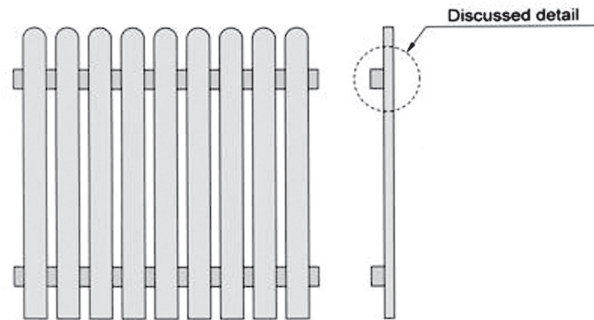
Detail of fence with vertical plank fixed to the horizontal construction
